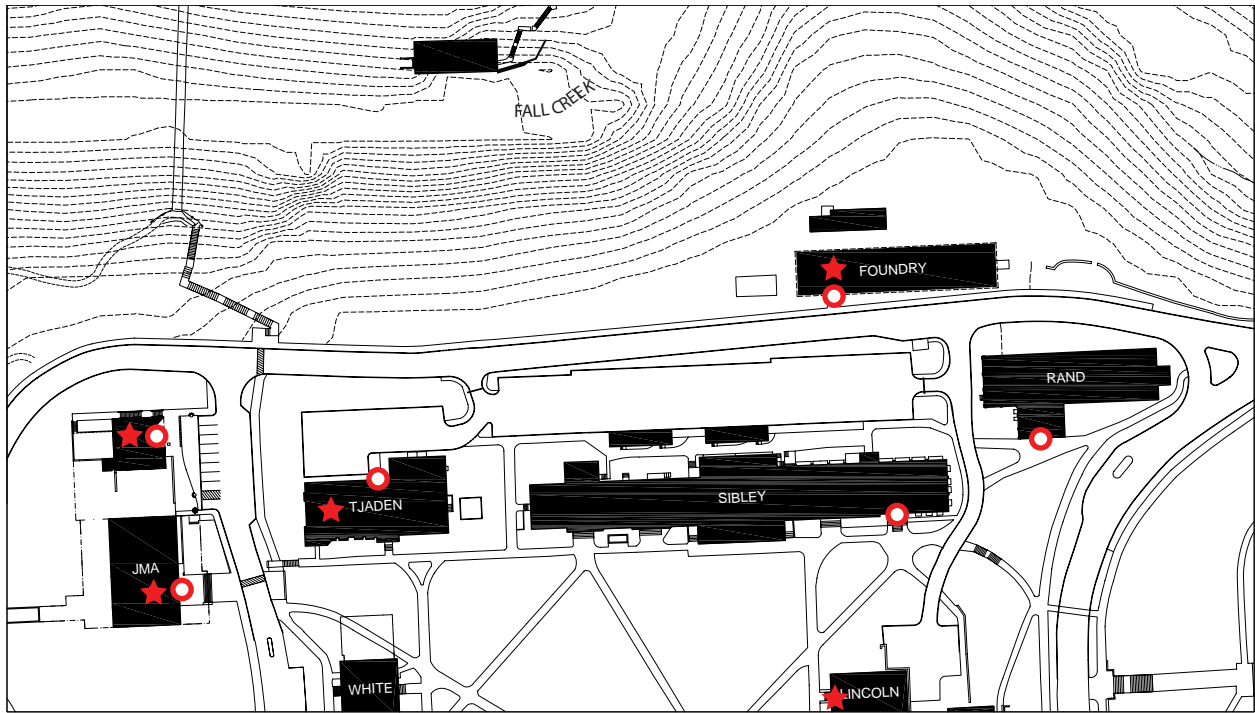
Existing ADA-accessible buildings and entrances.
